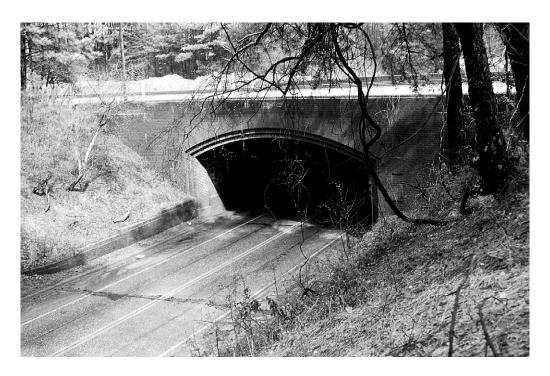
Concrete Rigid Frame with Brick Veneer, a U.S. Department of Public Roads Design, Built in 1936 at the Petersburg National Military Park (City of Petersburg Structure No. 8018)
